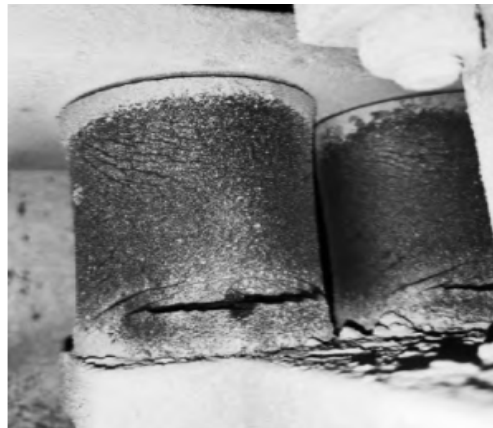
Cracks appear in the expansion joint spring element.
